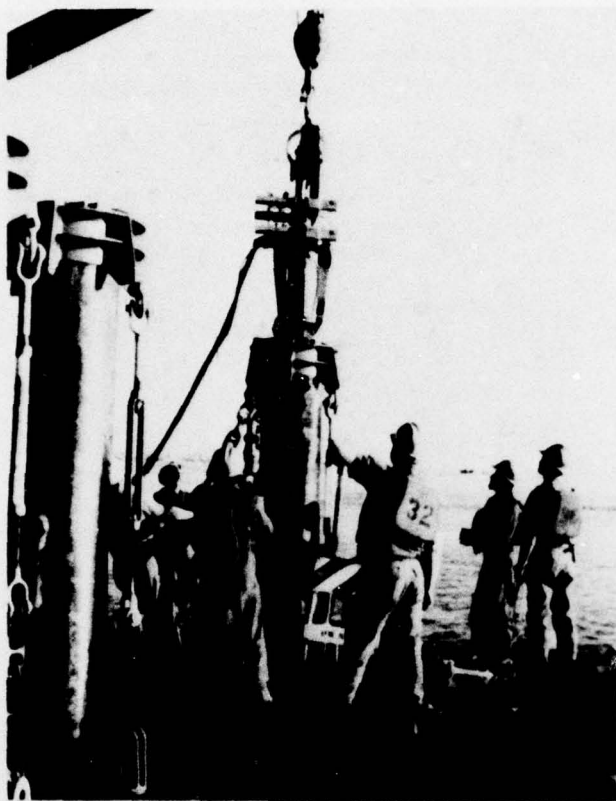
Top: hydraulic crane placing jack on pile in preparation of lowering pierhead.
